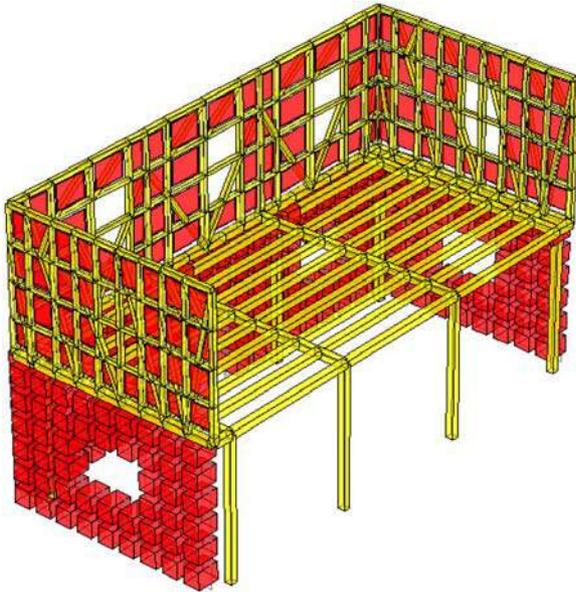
An open view of the 3D finite element numerical model (façade elements not shown).
